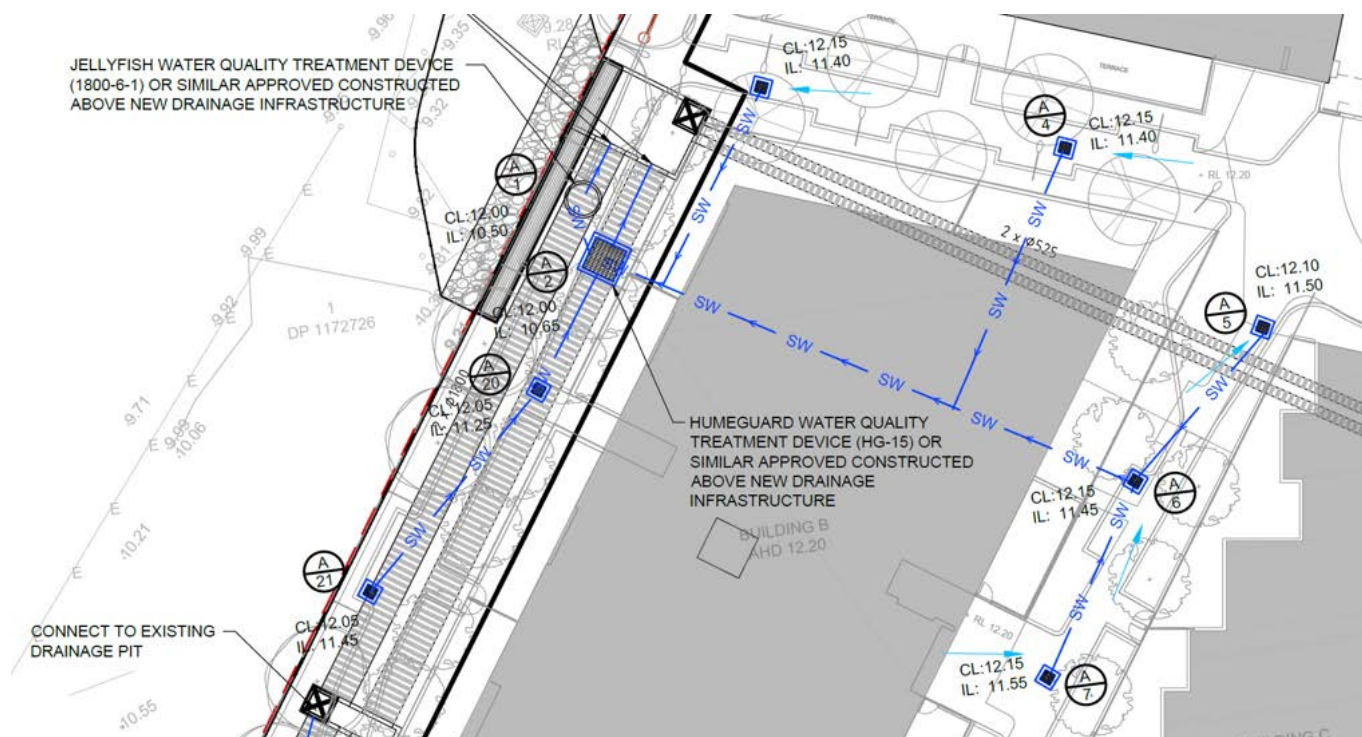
Excerpt from stormwater drainage plans for 78-90 Old Canterbury Road (Karimbla Construction Services 2014)
